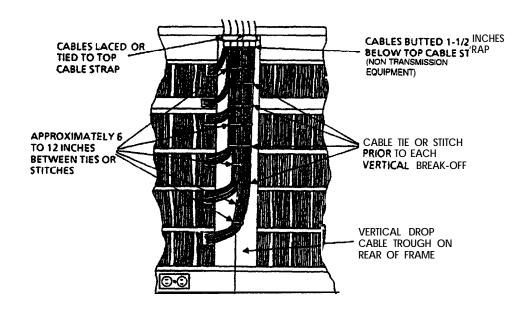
Cable Break-Off to Equipment (Matrix Type Frame)
